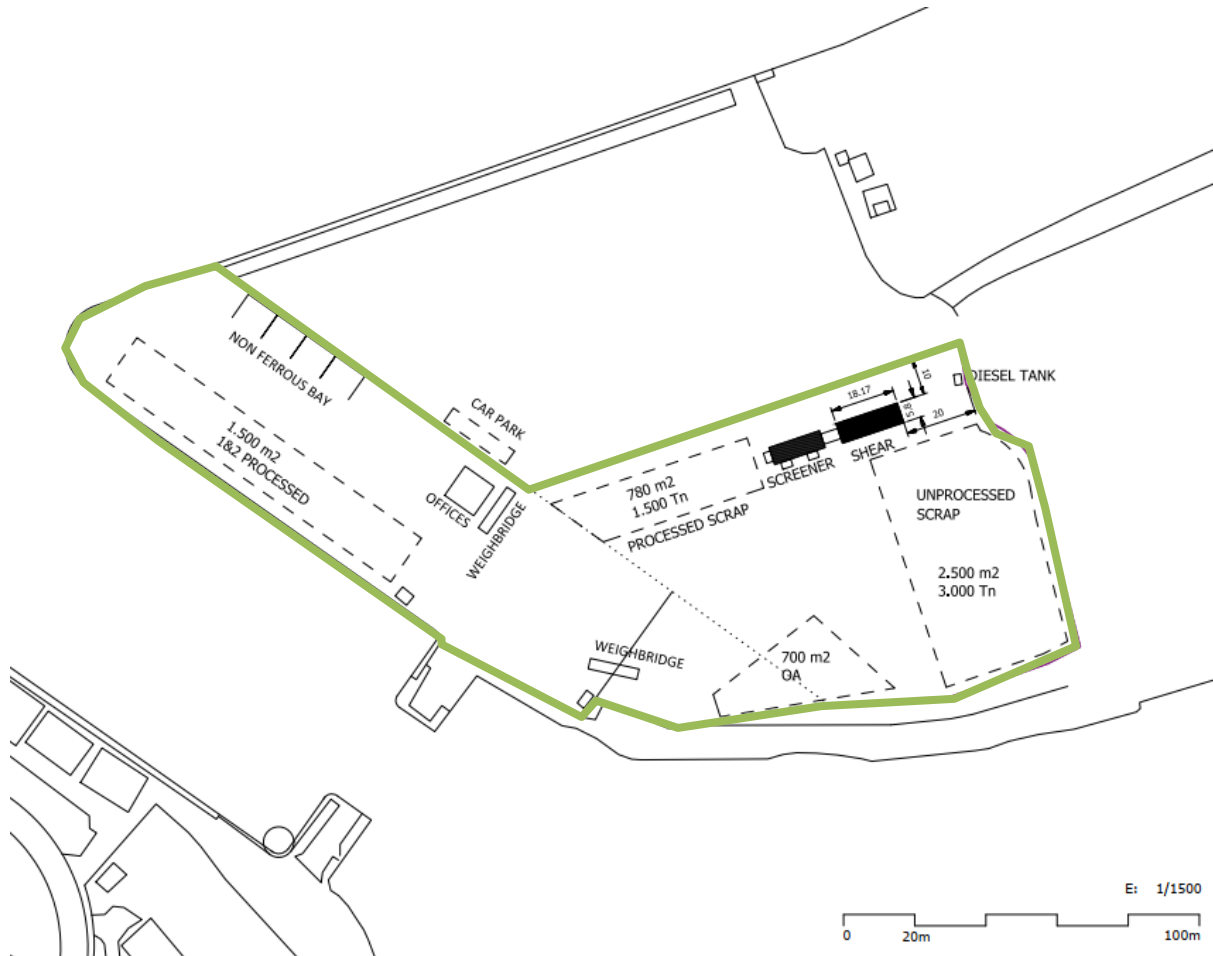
Installation boundary (outline in green) and layout, scale as stated
